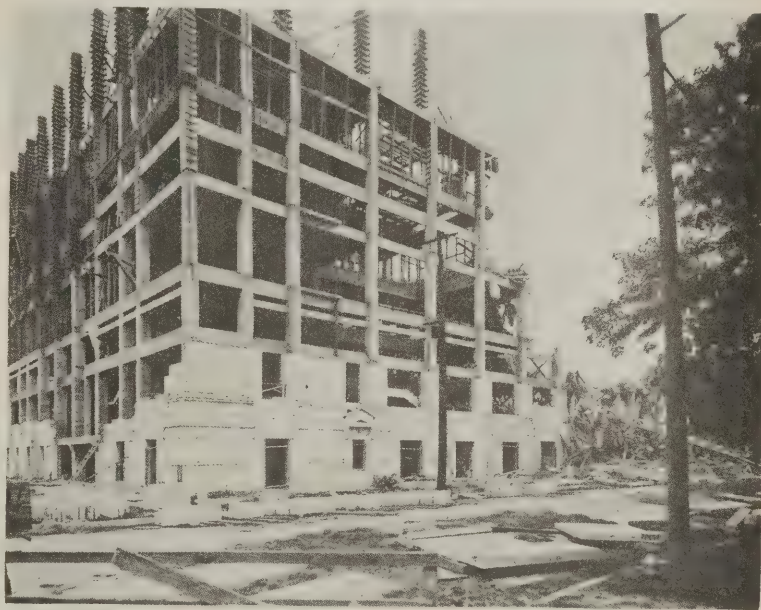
Southwest corner of Masonic Temple, after the collapse of a portion of the building, July 11, 1921
